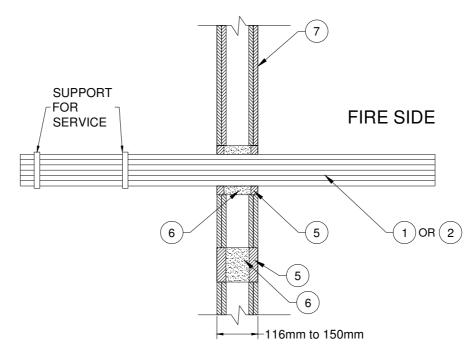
Typical Details for Cables and Metal pipes wrapped with Emat for Masonry Walls
